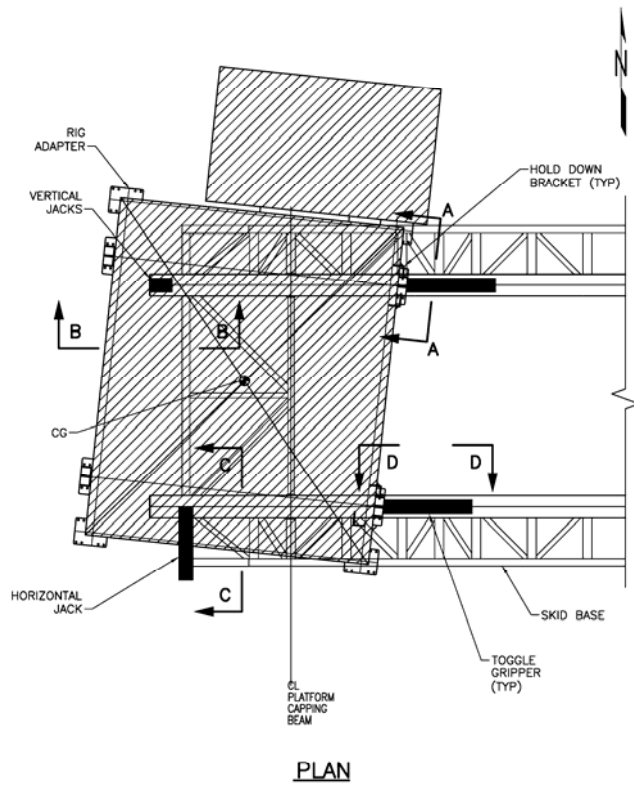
Horizontal jacking system (see plan in Figure 1 for location)
